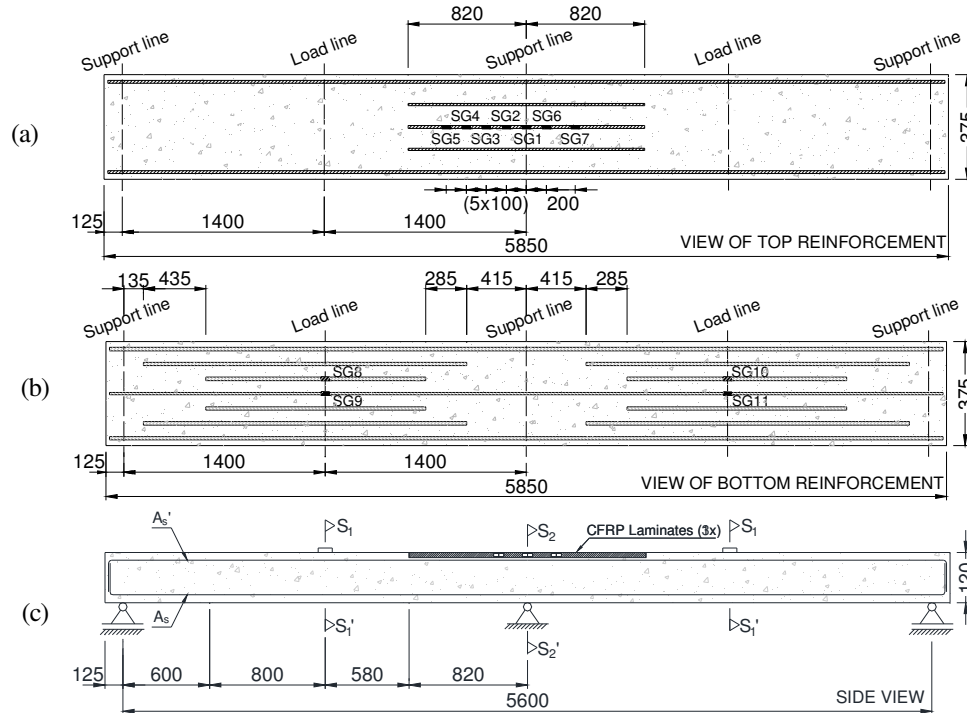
Arrangement of the (a-b) longitudinal steel reinforcement and (c) CFRP laminates of the SL45s50-H slab strip.
